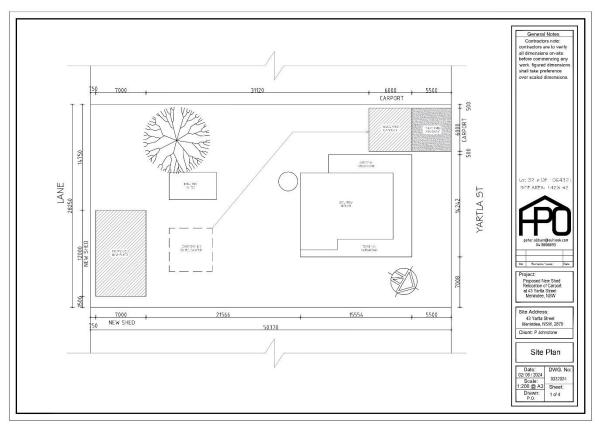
Proposed site plan new shed & carport relocation Lot 32 DP 1064321, 43 Yartla St Menindee
